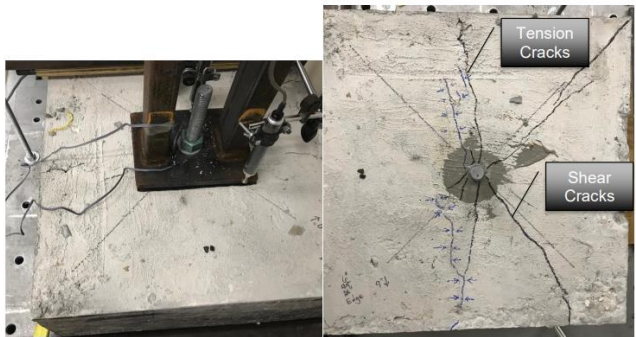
Typical Concrete Breakout/Pry-Out Failures Found in Concrete Block Specimens
